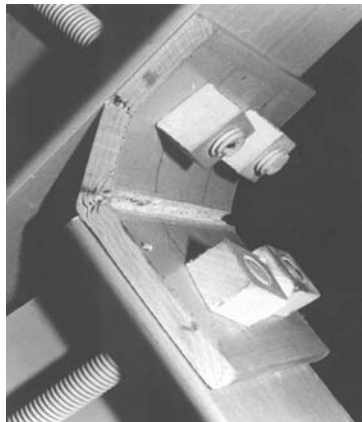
Premature failure of steellike connection details (Mosallam, 1993).
